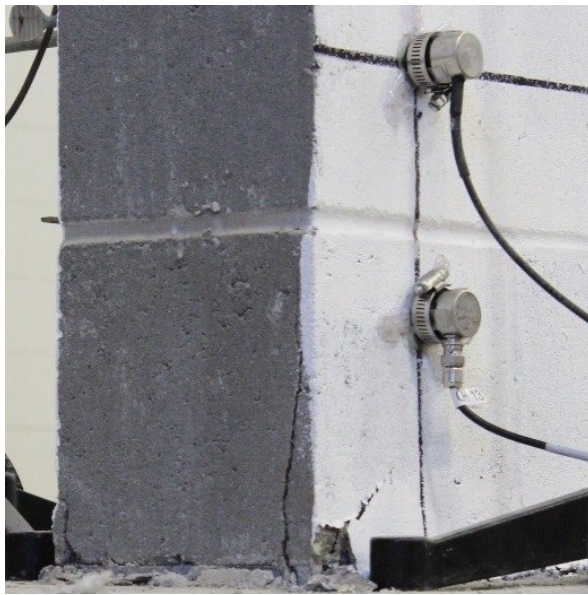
Shear Wall One damaged (the shear crack is indicated in green)
